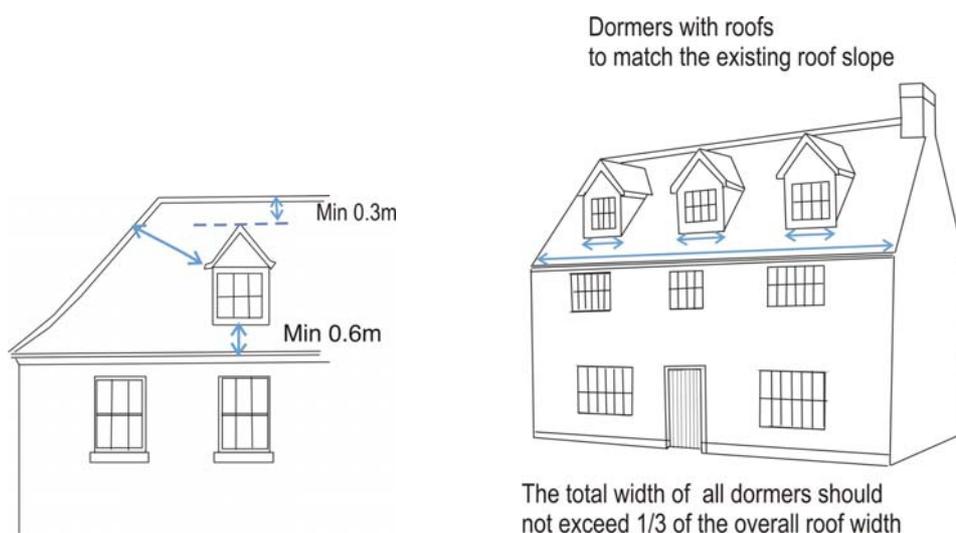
& b Design principles to ensure dormers are in proportion with the roof.
